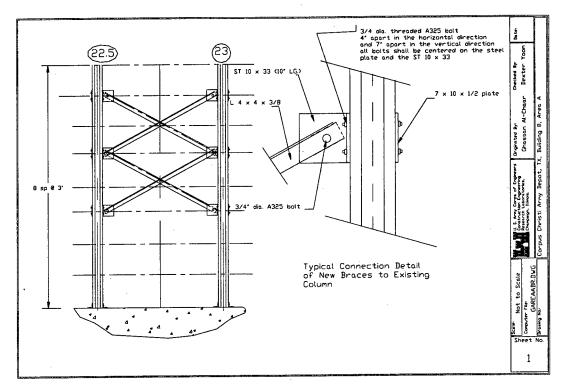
Proposed braces for bay 22.5 – 23 along column line M.
